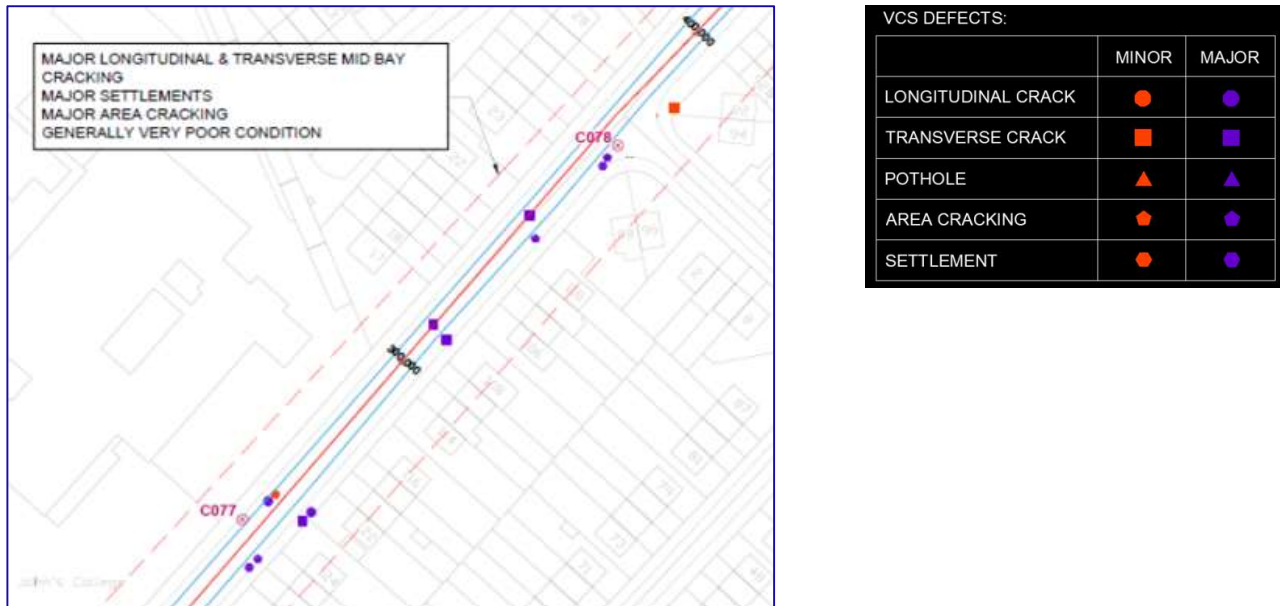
Example Ranking of Pavement Condition and the Type and Location of Defects Observed.
